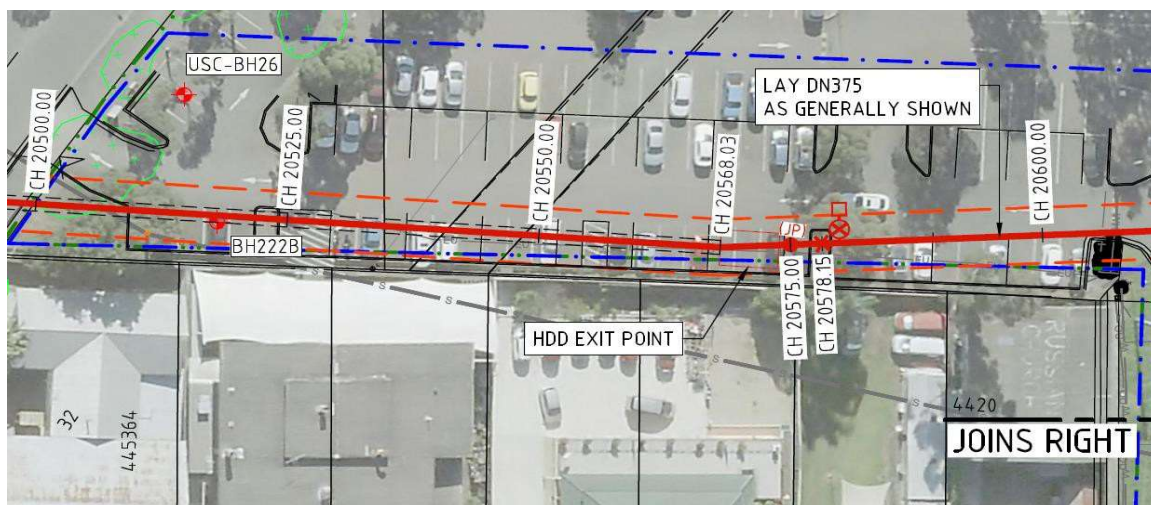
Cabramatta Railway Crossing (eastern side) parking space removal area
